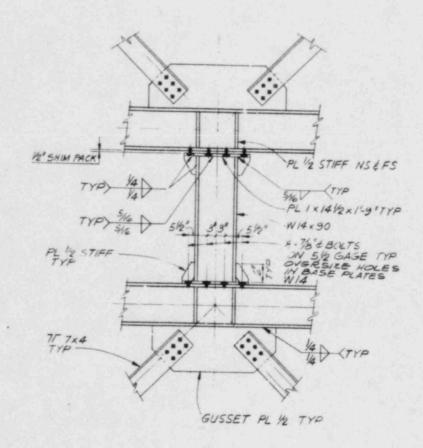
STRUCTURAL STEEL DESIGN DETAILS (Sheet 8 of 9)
